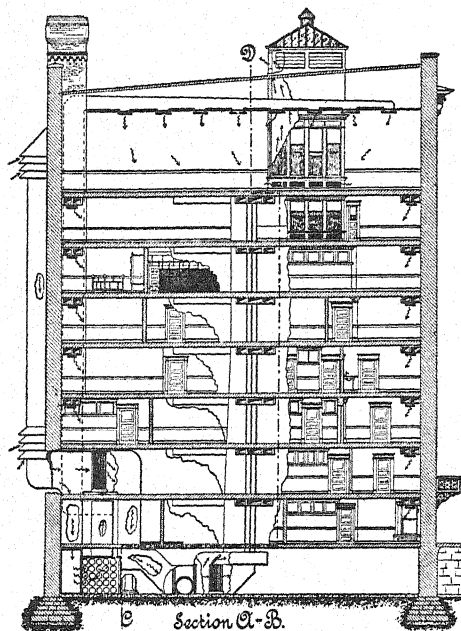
Chicago Telephone Company. Plan of ventilating plant.
